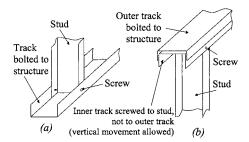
Stud-to-track connections: (a) bottom track; (b) top slip track
